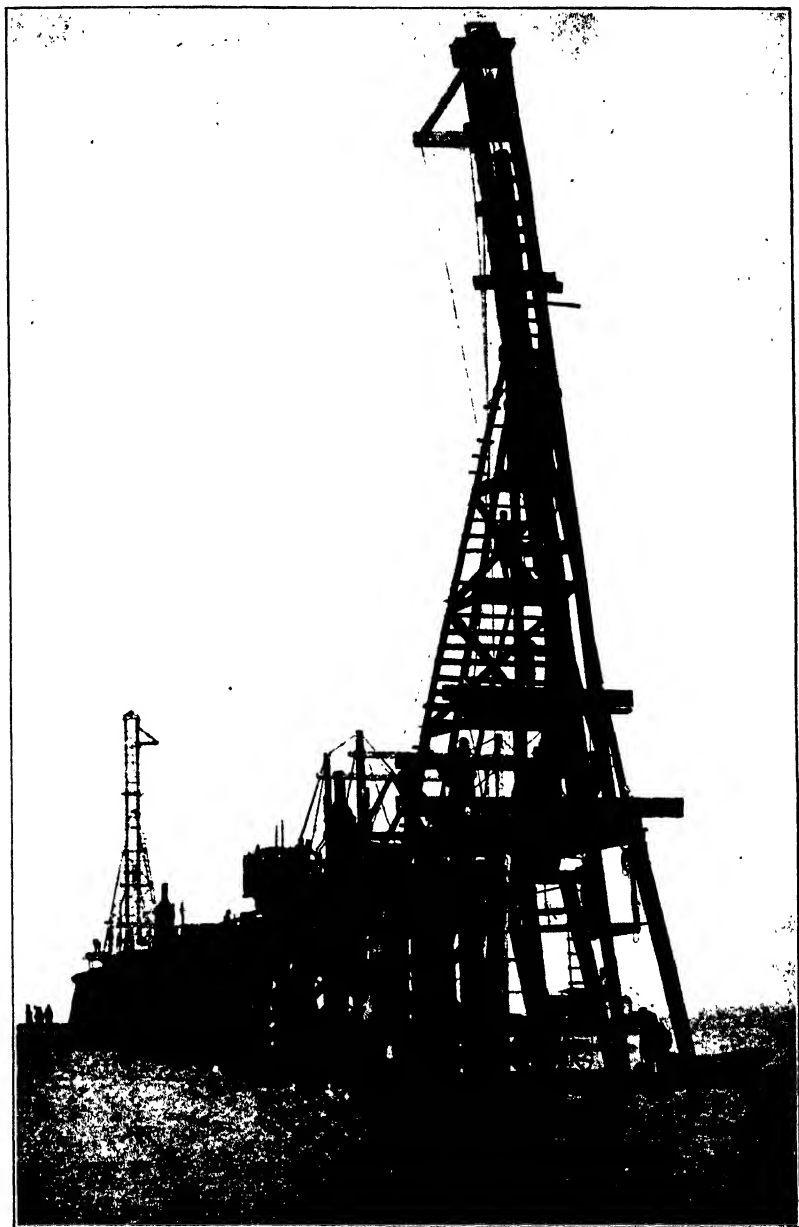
Driving Batter Piles on the Trestle Approach to the Central California Railway Bridge over San Francisco Bay at Dumbarton Point, August 14, 1907.
